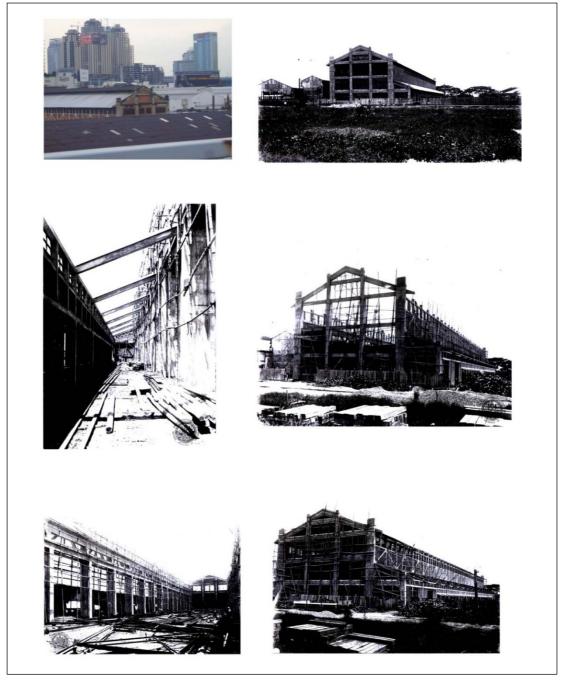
The Foundry building seen in 2009, and under construction (source: The National Archives, Bangkok. Date unknown) (photograph: author)
